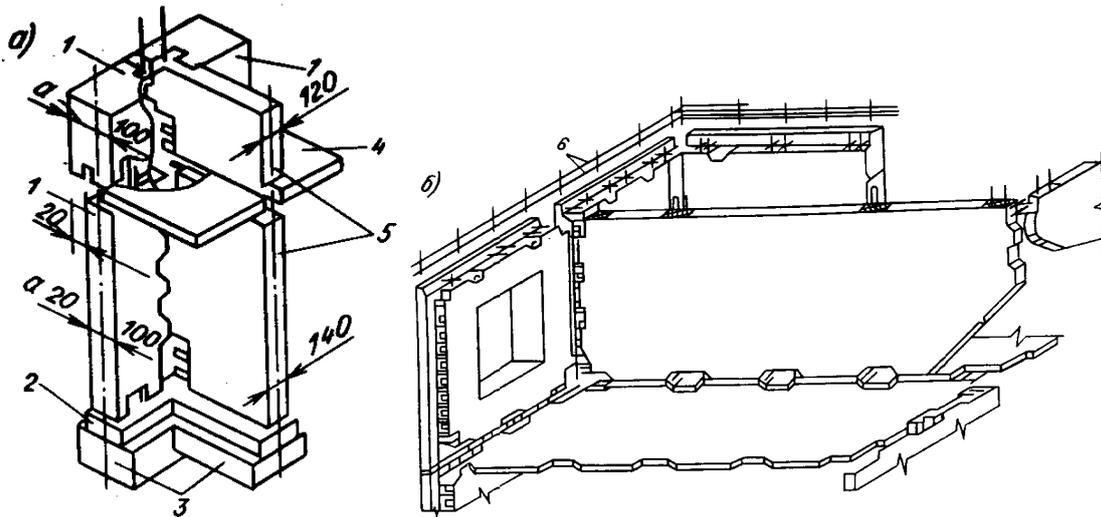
Large panel building structures: a - connection of foundation and wall; b - connection of walls and covers; 1 – outdoor courtyard panels; 2 – monolithic reinforced concrete belt; 3 – foundation blocks; 4 – closing panel; 5 – internal wall panels; 6 – rounding belt frame.
